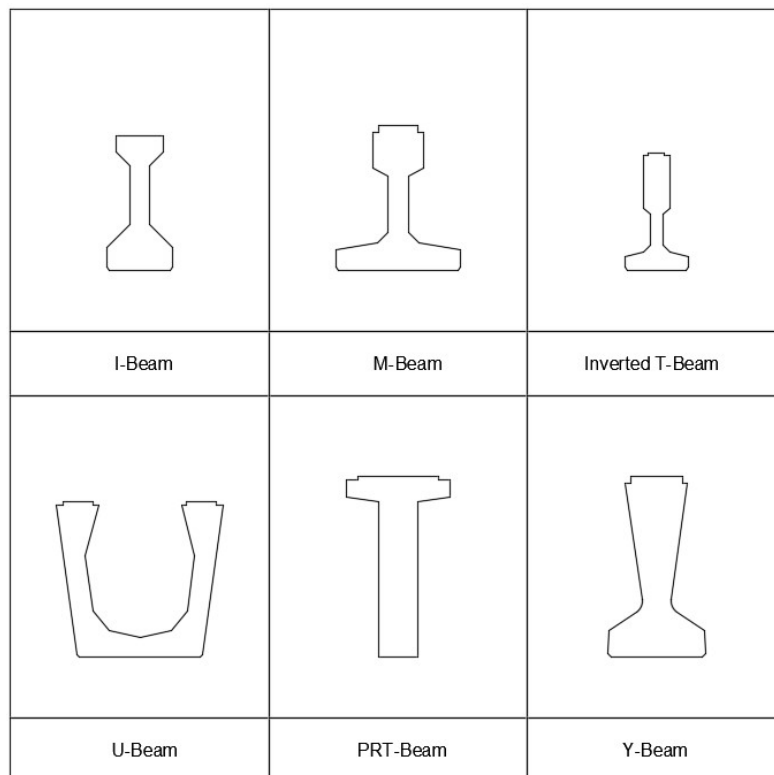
Different cross-sectional shape for precast prestressed bridge beams
